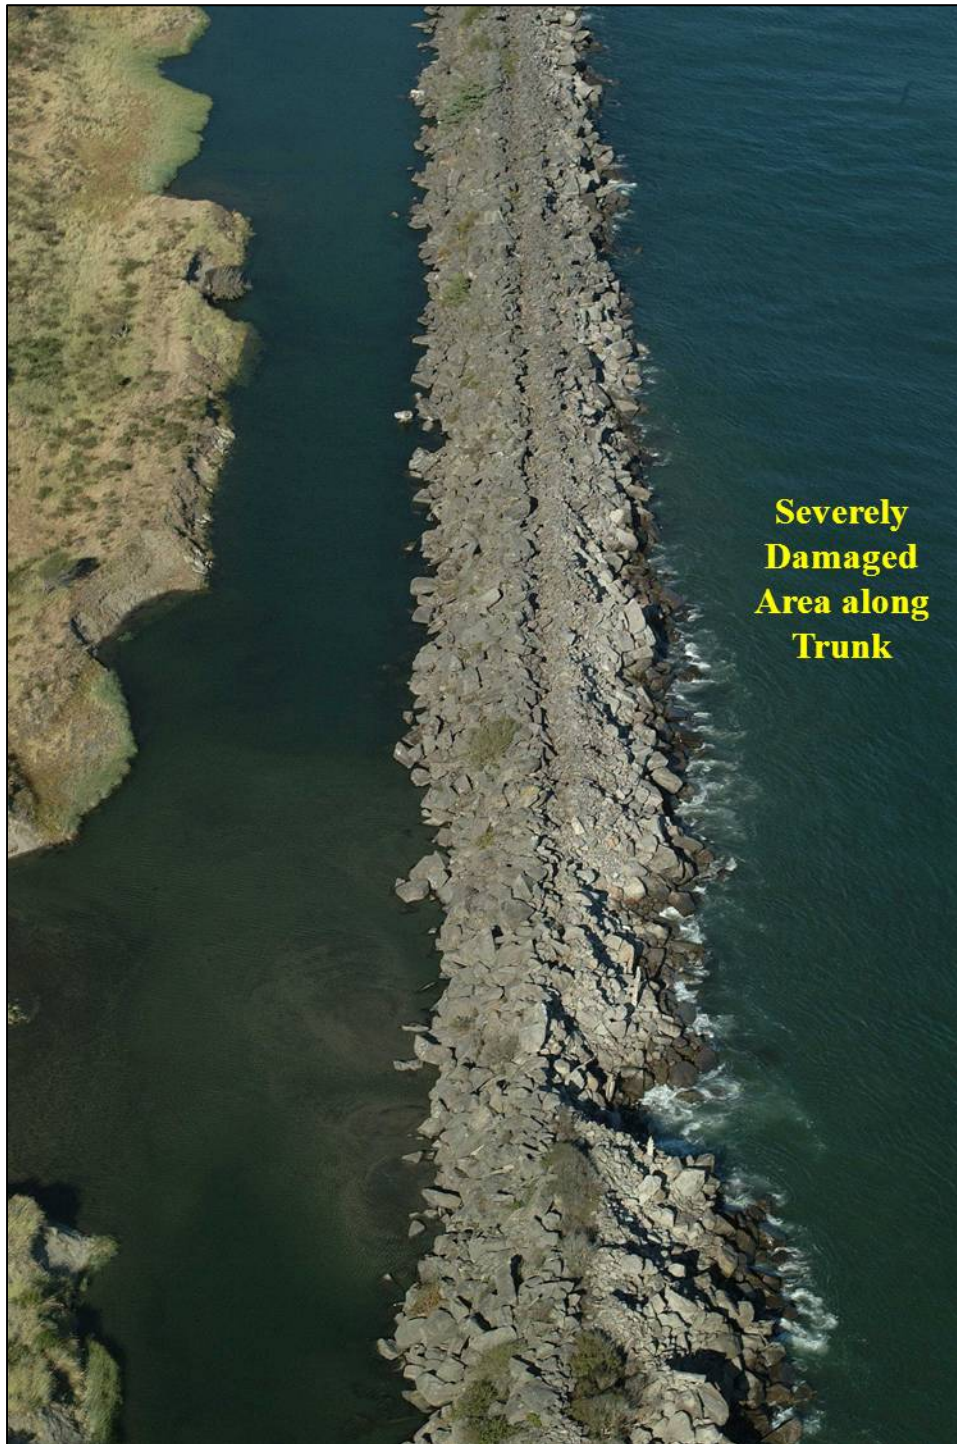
103. North Jetty Trunk Damage Prior to Interim Repair
